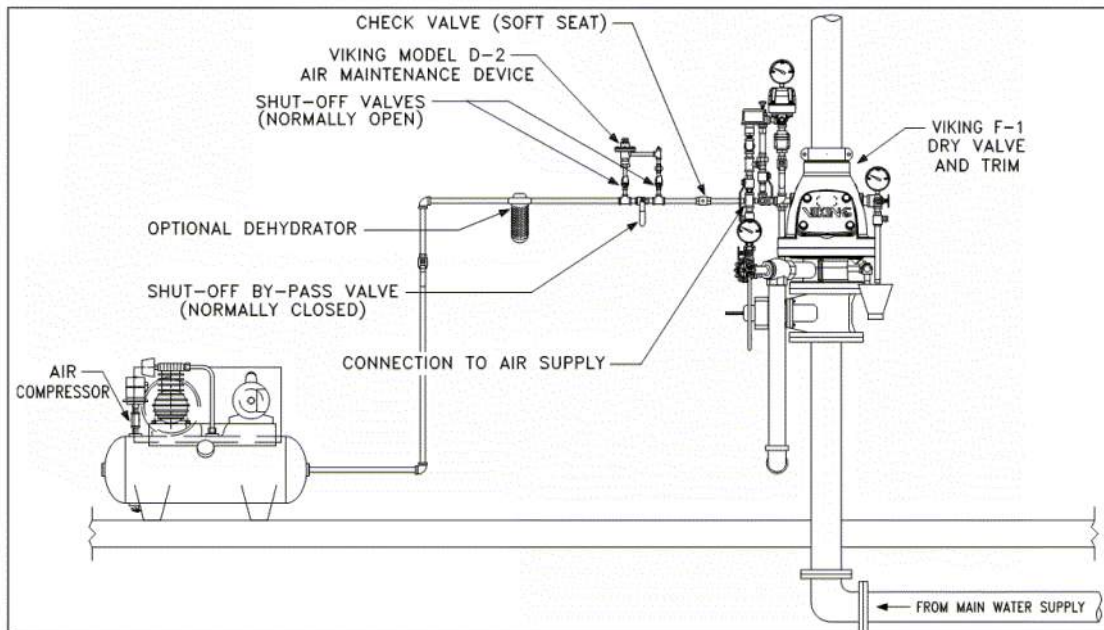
Typical Dry-Pipe Assembly with local Floor Mounted Air Compressor for Automatic Filling (Viking)
